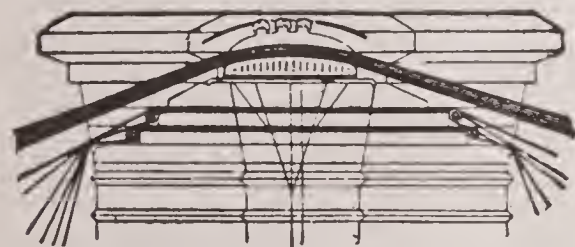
SADDLE-PLATE, TOWER OF EAST RIVER SUSPENSION BRIDGE OF 1883.
